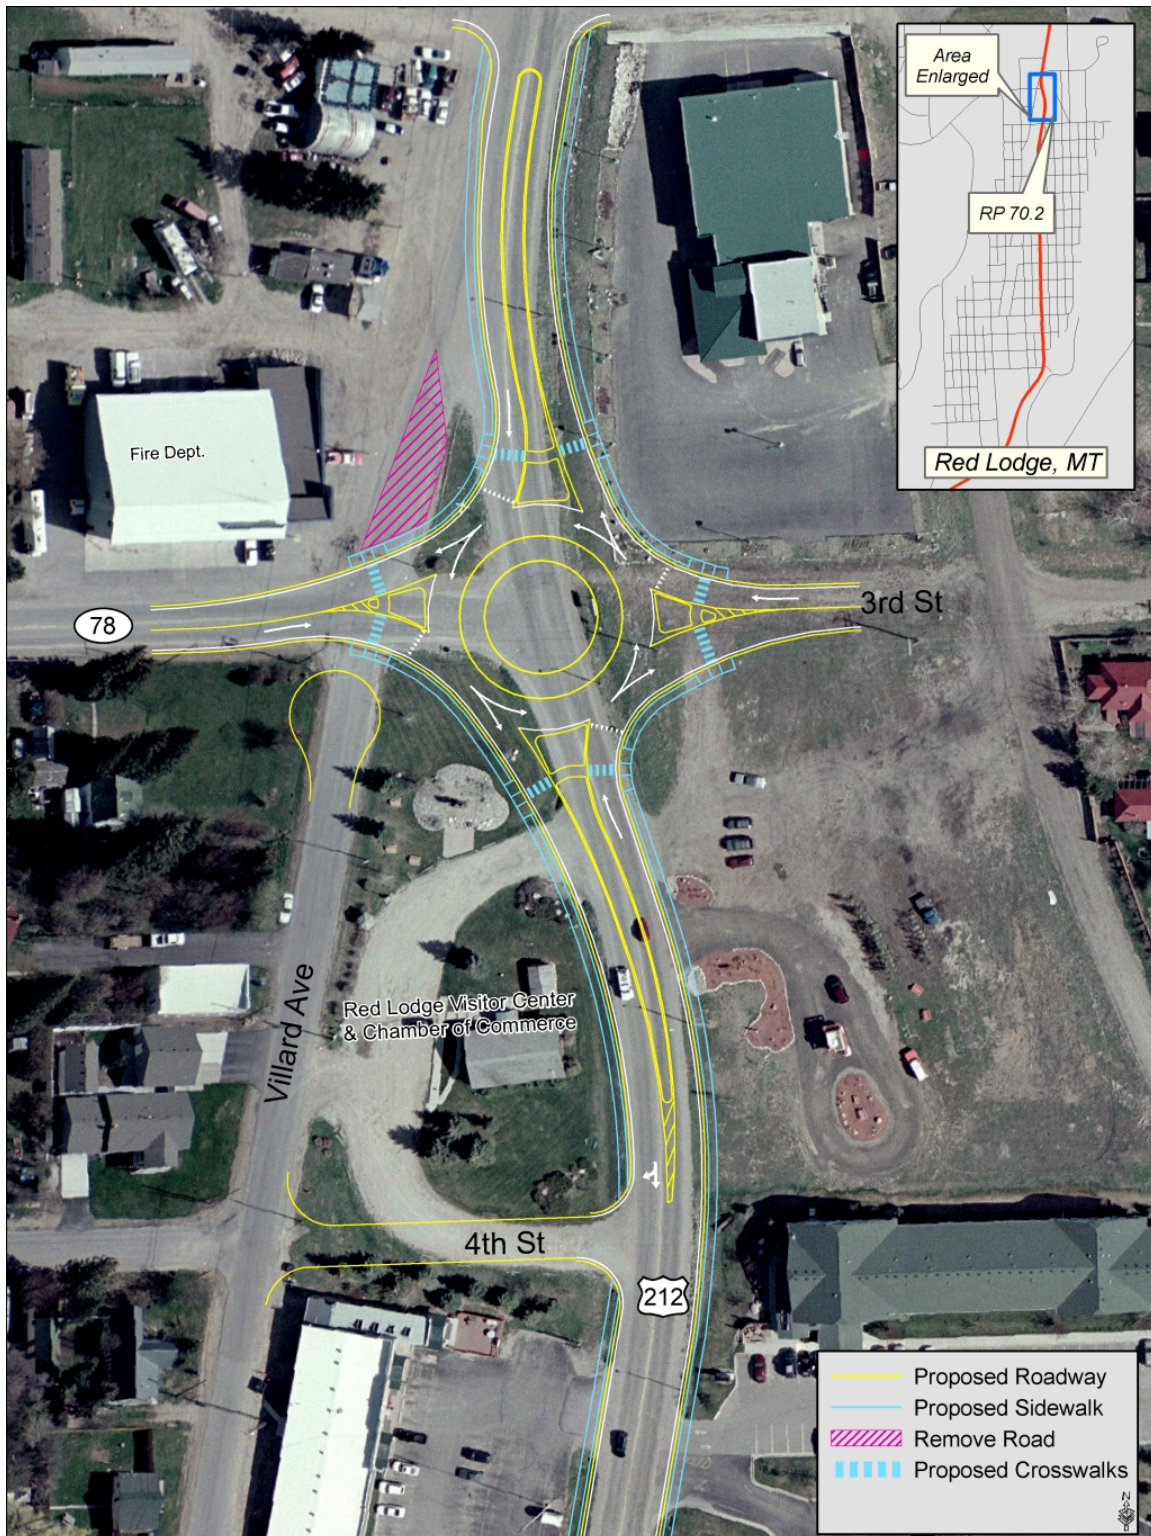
, MT Highway 78 / Villard Avenue Intersections
